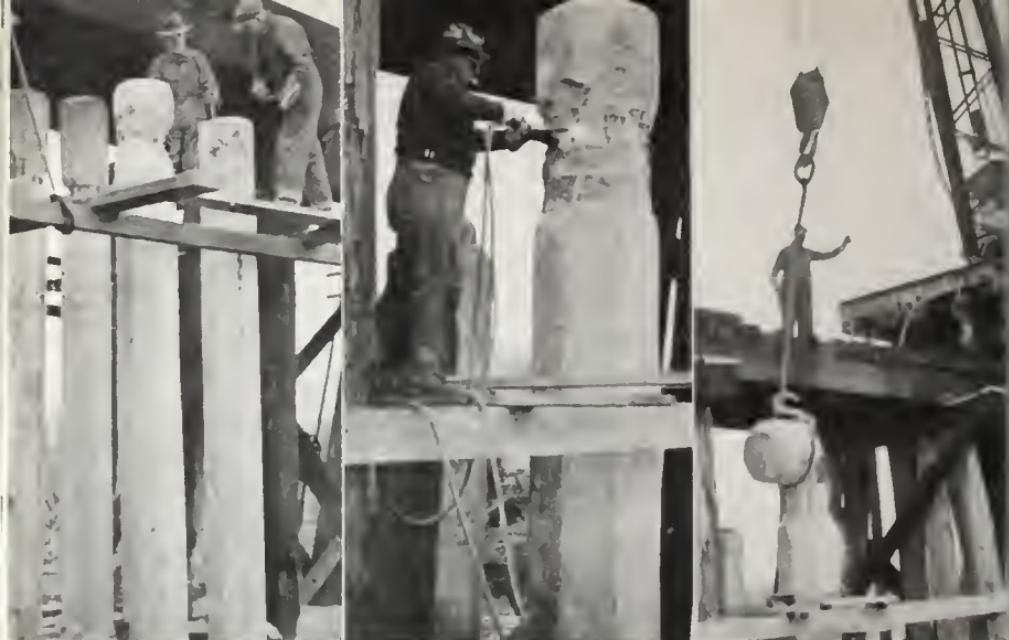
(a) to (c)—Steps in cutting off concrete piles:
